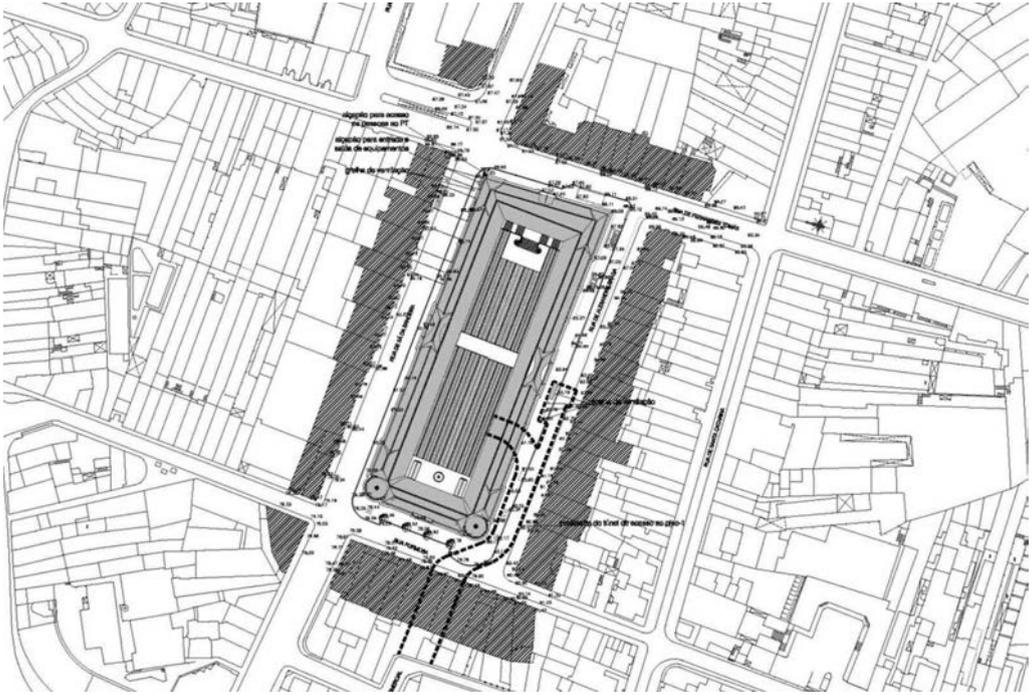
Roof Plan - Access to basement made through a tunnel, from Ateneu Comercial street
